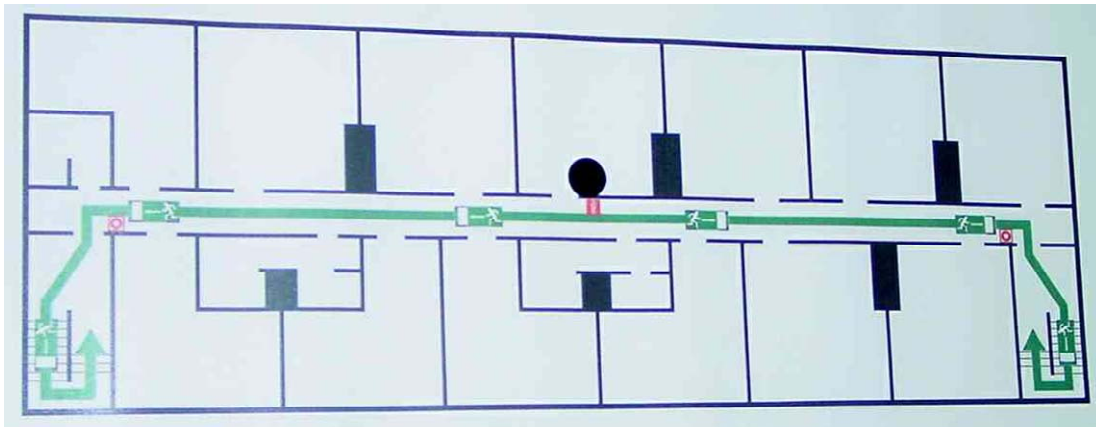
Floor plan/Bldg 7522 – Germersheim.
